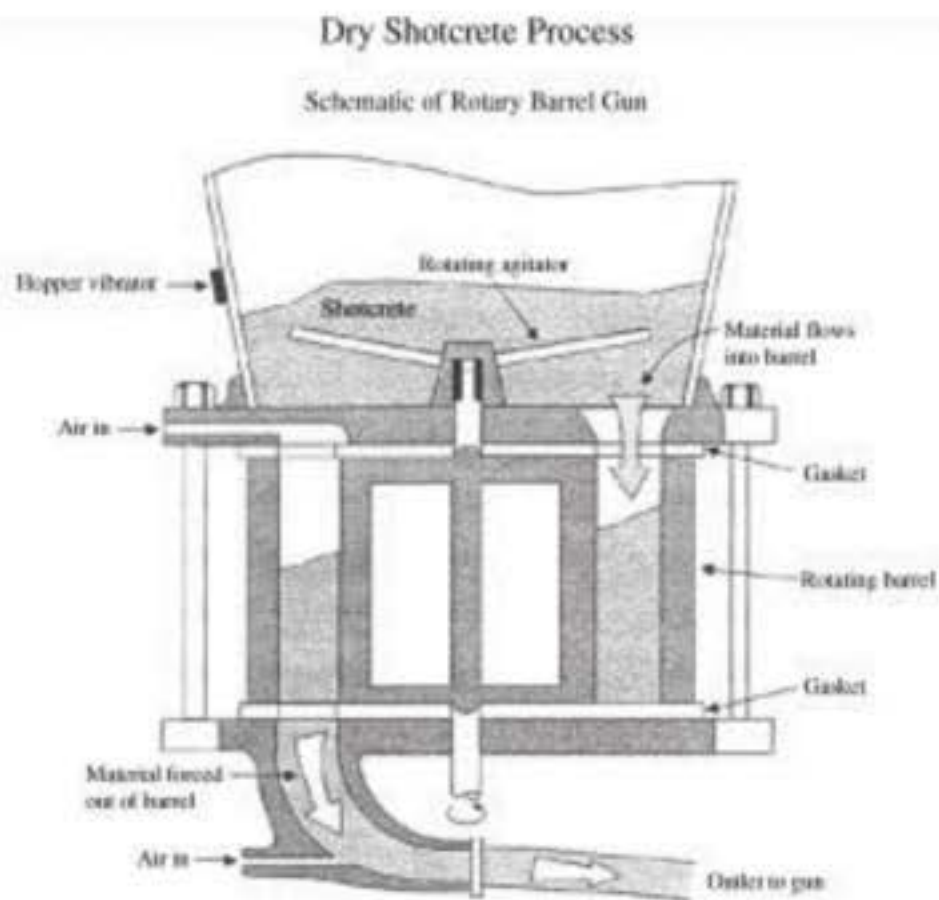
GM57: rotary barrel gun with cutaway view.
